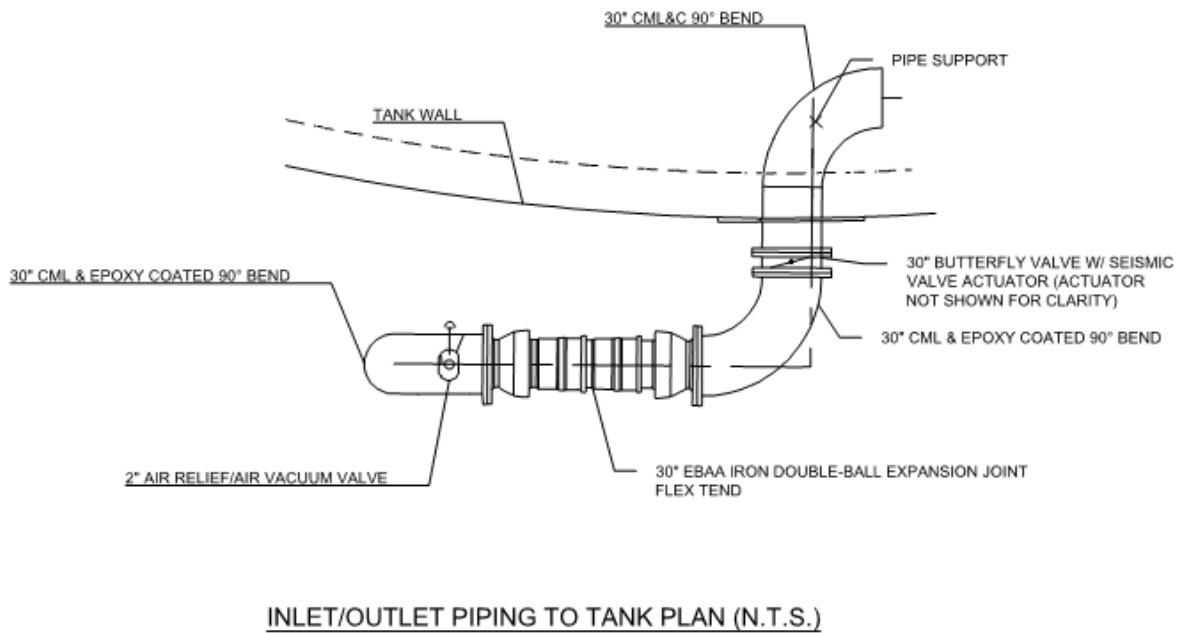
Inlet/Outlet Piping to Tank (Plan)
